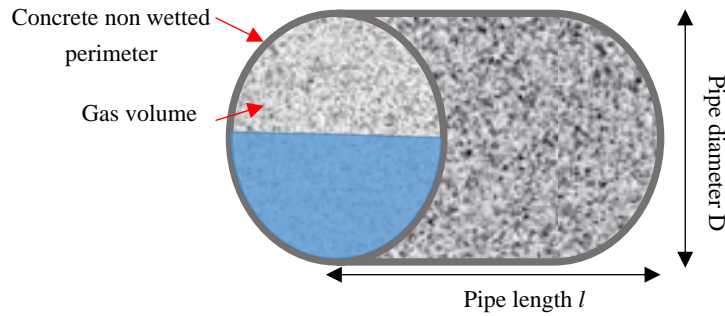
Schematic diagram illustrating a half-full wastewater flow in a sewer concrete pipe
